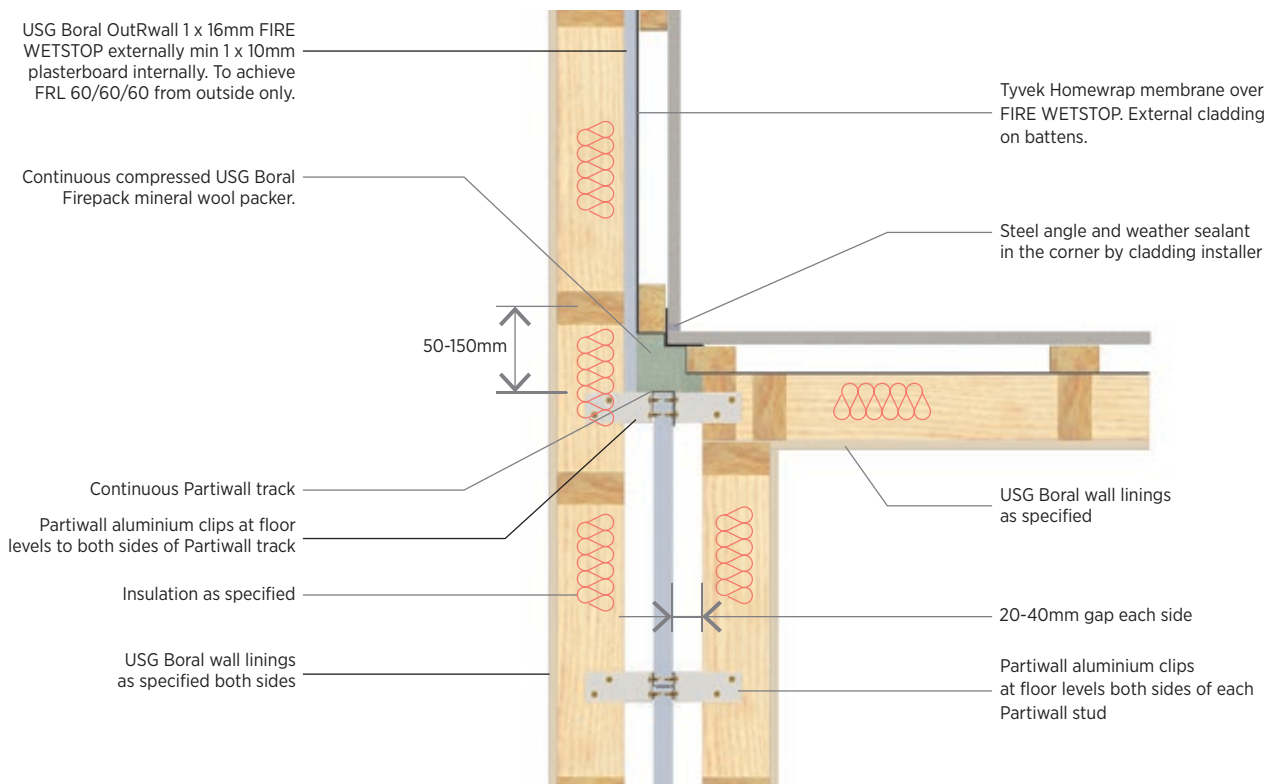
Clad Wall Junction Detail - FRL 60/60/60Figure 23: Partiwall® to OutRwall® Plan Detail - FRL 60/60/60
